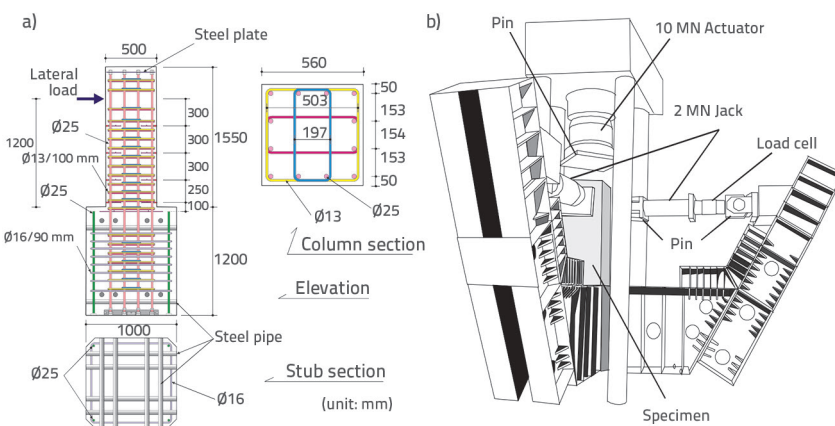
Specimen dimensions and loading system for large specimens [17, 18]: a) Reinforcement configurations; b) Loading system
